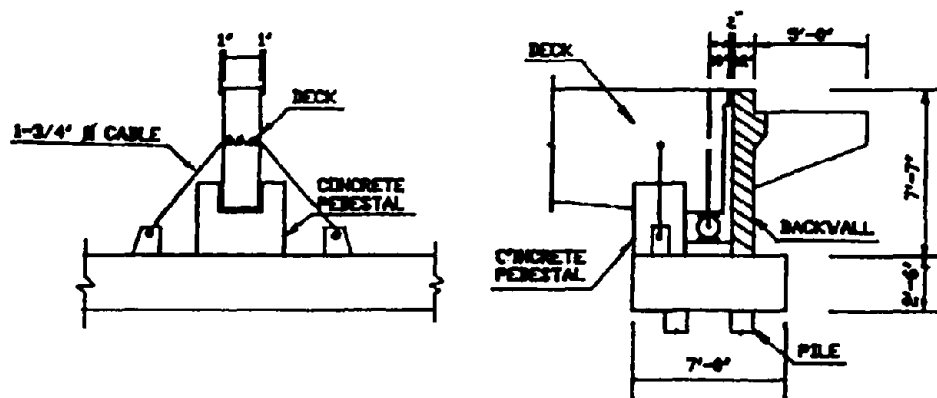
Abutment Retrofits in San Gregorio Bridge.
